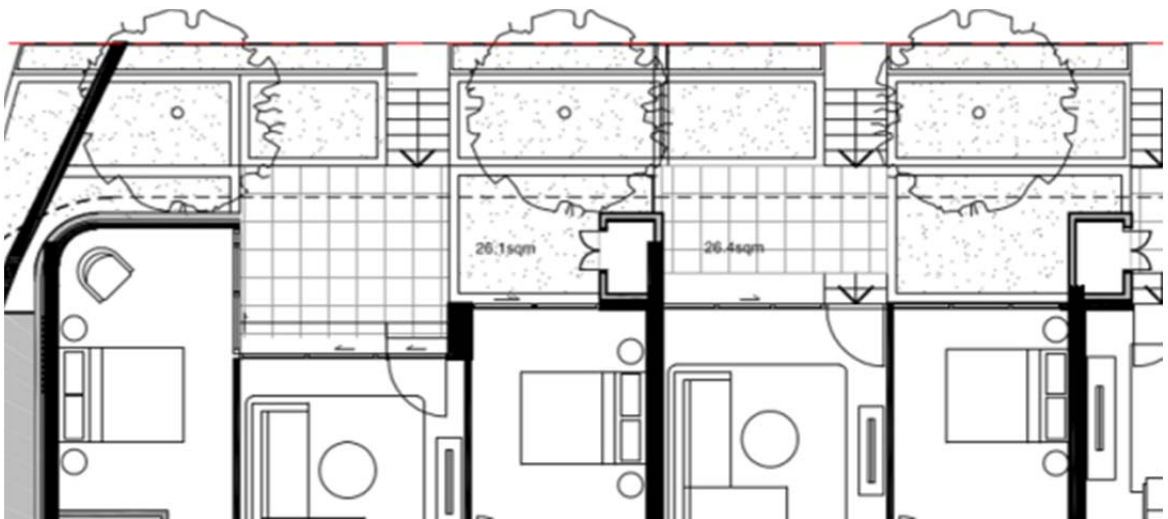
Plan of the proposed staggered landscaped setbacks to the ground floor of the residential flat building.
